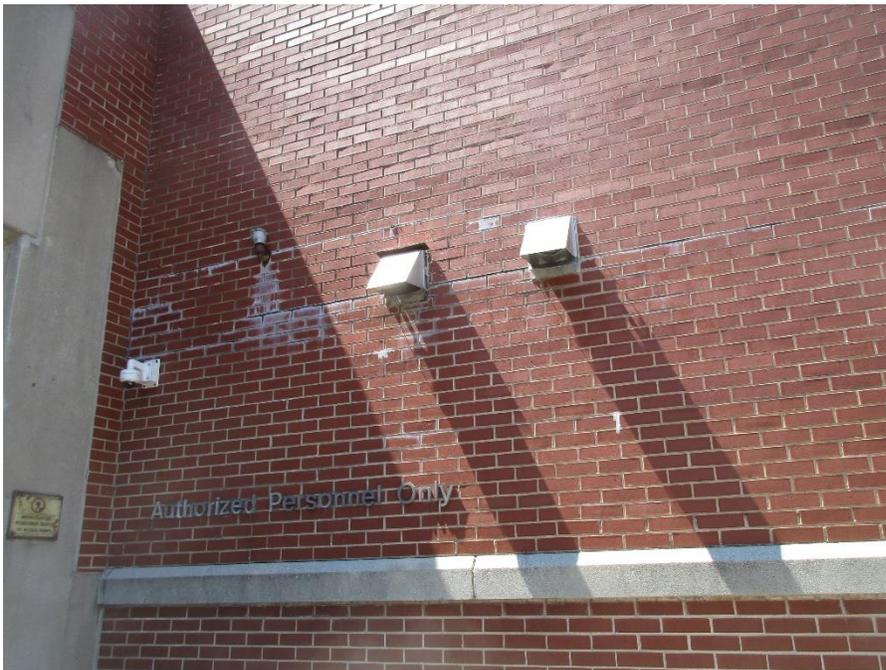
Efflorescence through the joints of the brick masonry facade adjacent to the base of the ramp on the north exterior of the structure.
